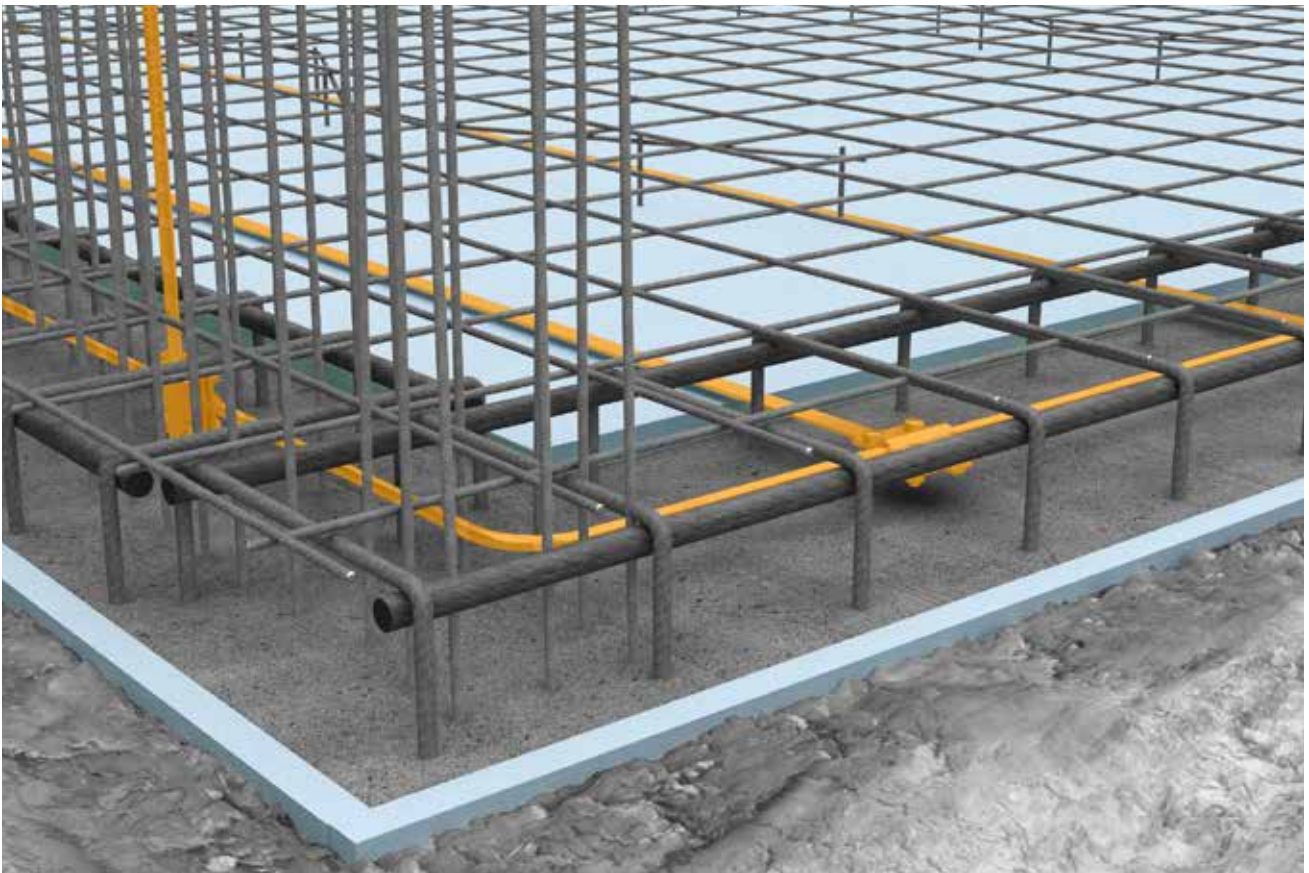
Insulated floor plate (perimeter insulation, shown here in blue)
